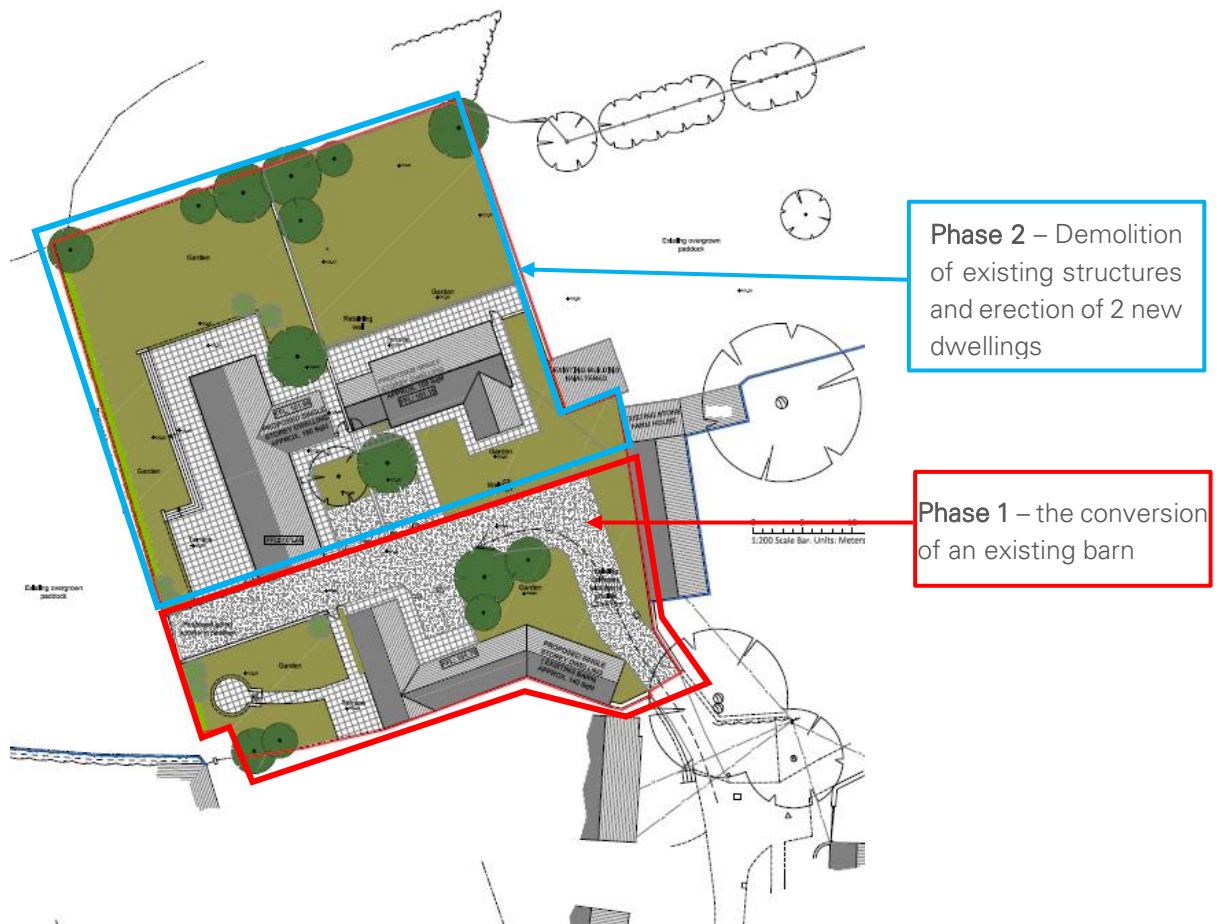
Illustrative outline planning permission layout LPA Ref.: 19/00250/OUT
